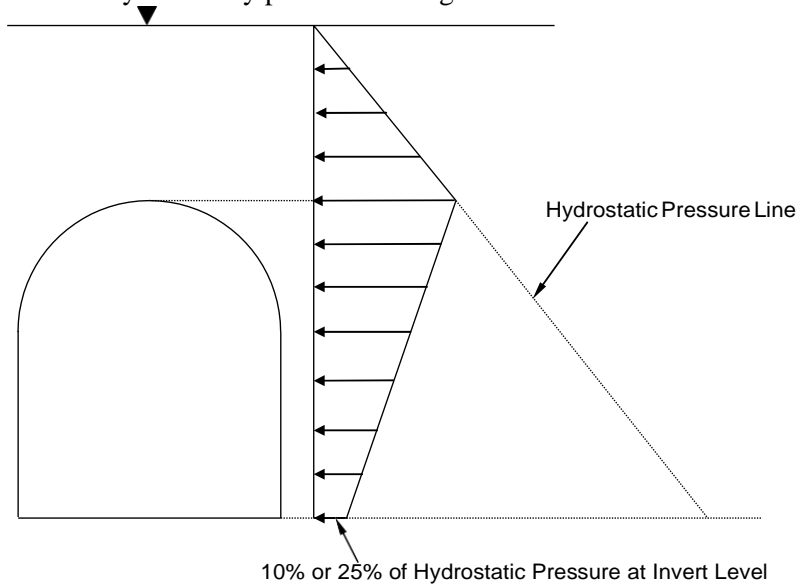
Empirical Groundwater Loads on the Underground Structures
